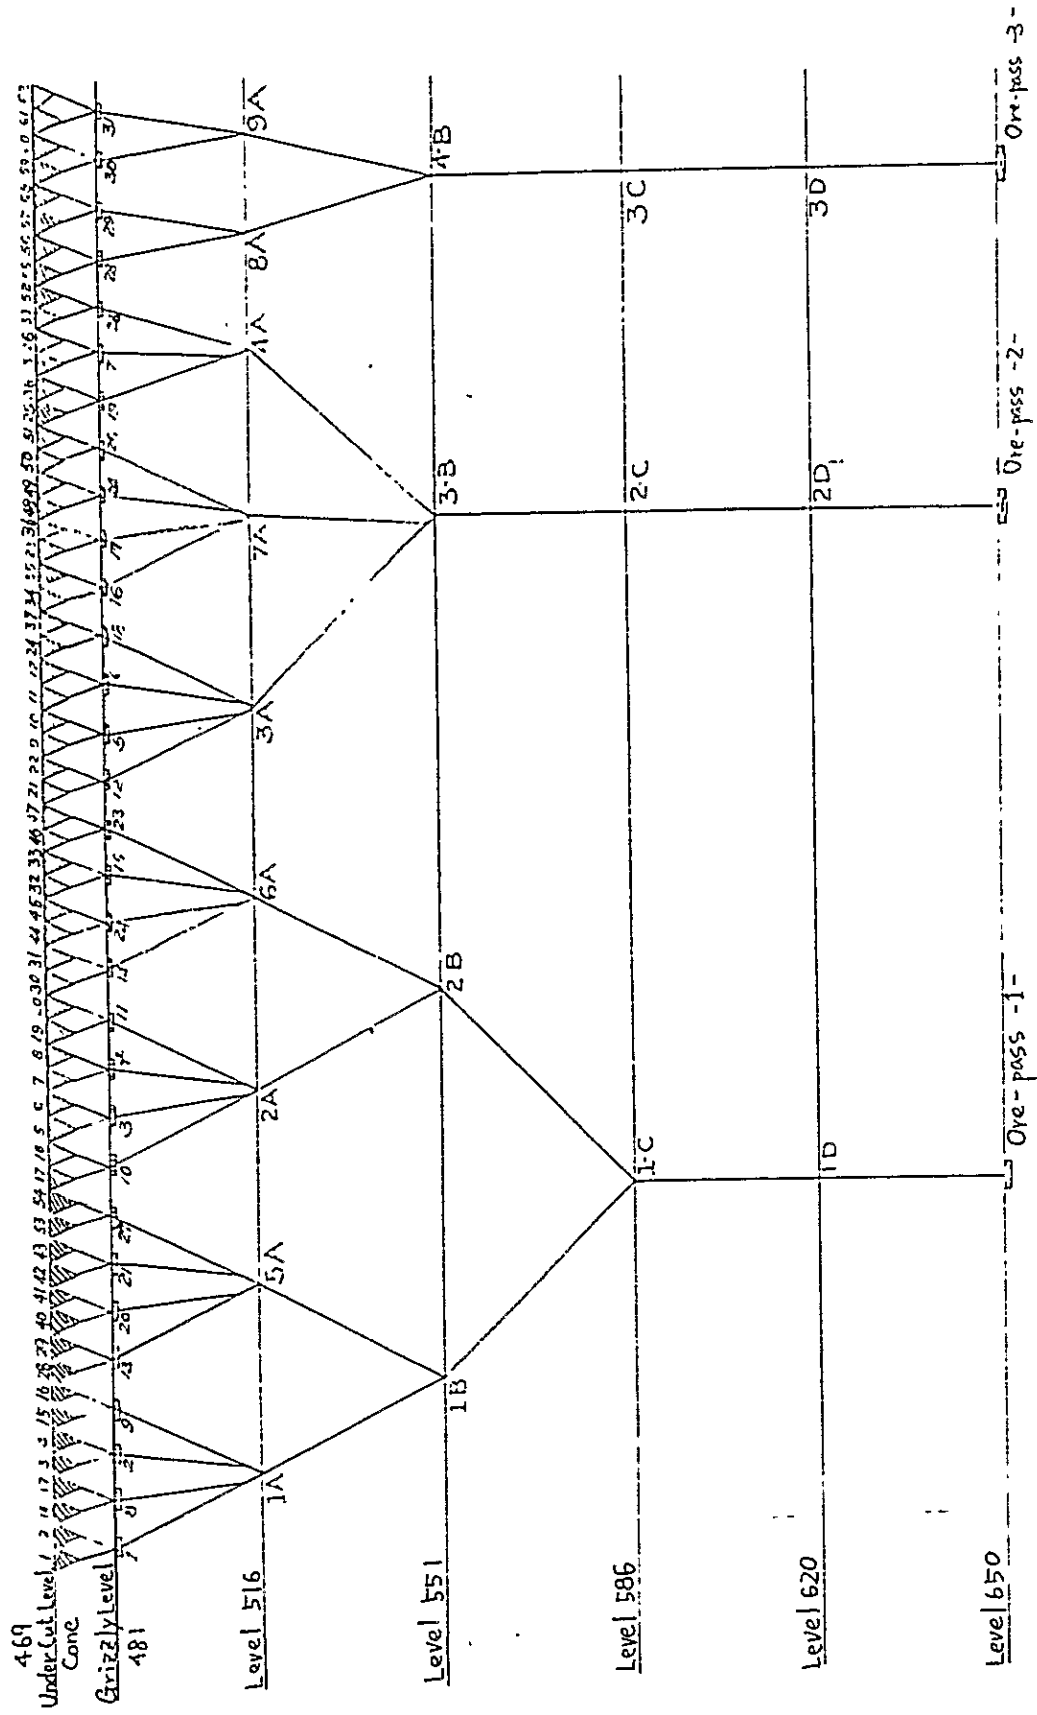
Typical Arrangement of Ore-Pass, Block 5-D
